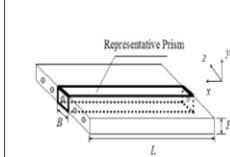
Drawing. Schematic details of representative reinforced concrete prism.
